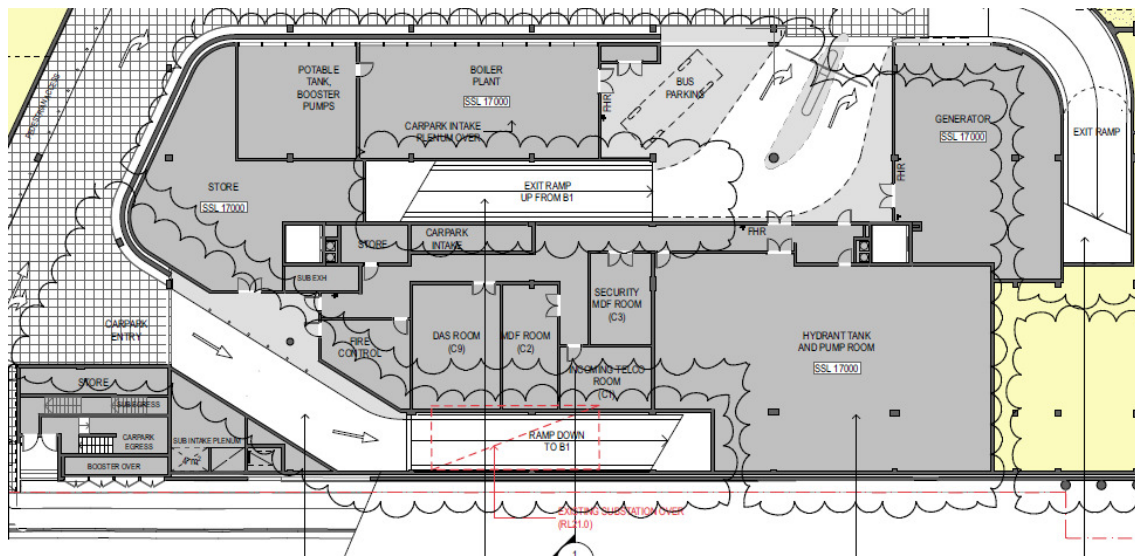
Lower Ground/ Club entry (porte-cochere)- 0.7m to 6.5m (the building has shifted towards the Evans Street frontage with the boundary shown in broken red line)
